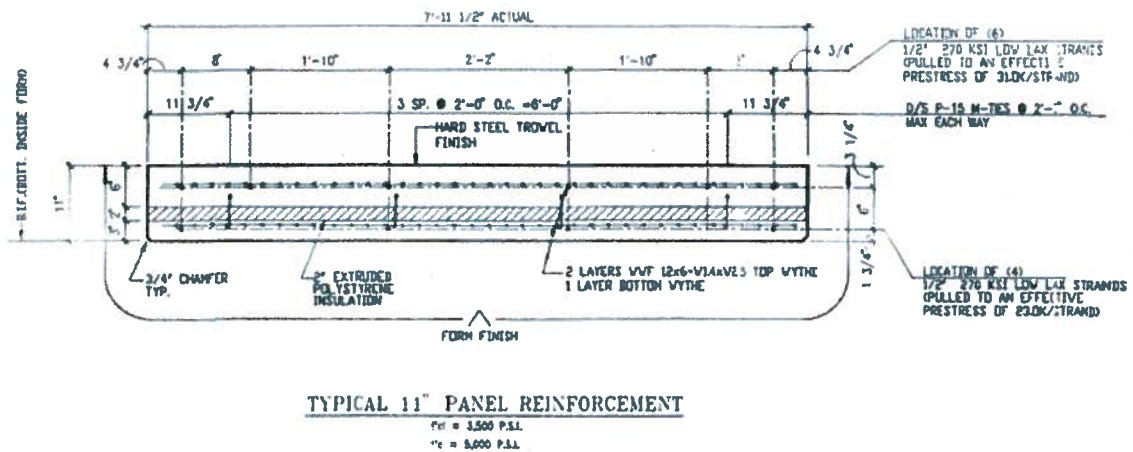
Typical exterior wall section (PDM Shop Drawing E12)
